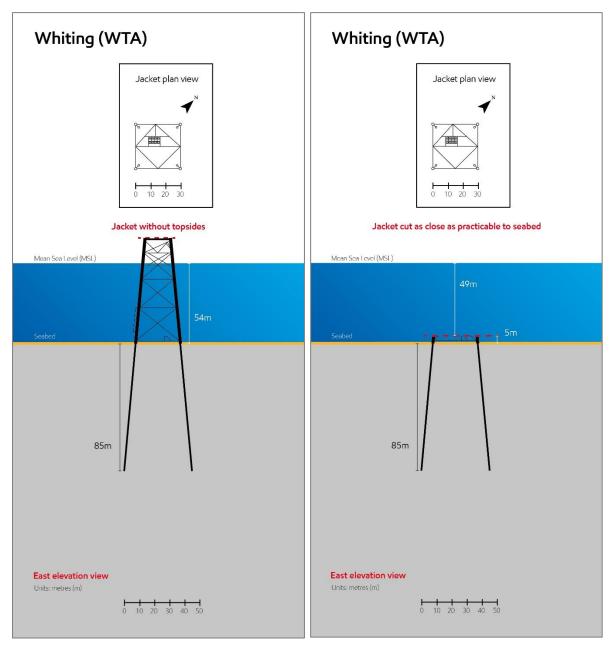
Whiting Steel Piled Jacket without topsides (left) and Steel Piled Jacket under proposed end state (right)
